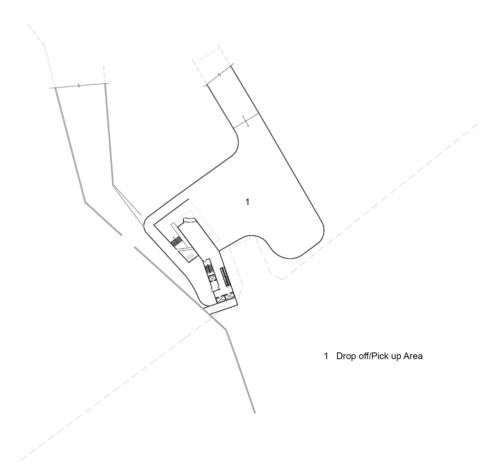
1st Floor Plan, Scale: 1/1500
